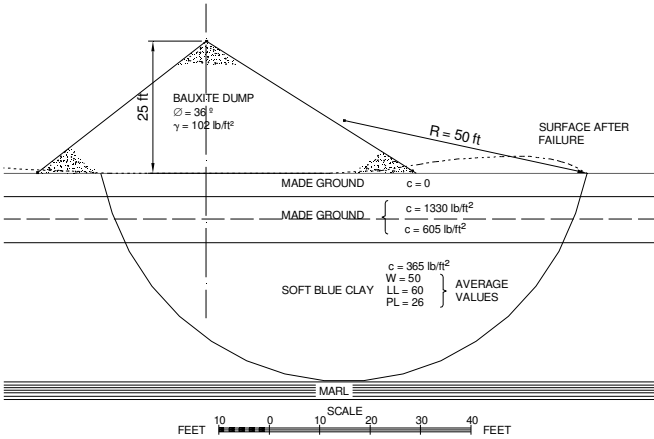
Failure of a Bauxite Dump at Newport (after Skempton and Golder; 1948)
